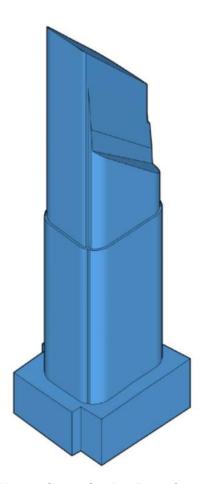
3D view of the Hunter Street Station Base Case West site provided by FJMT
